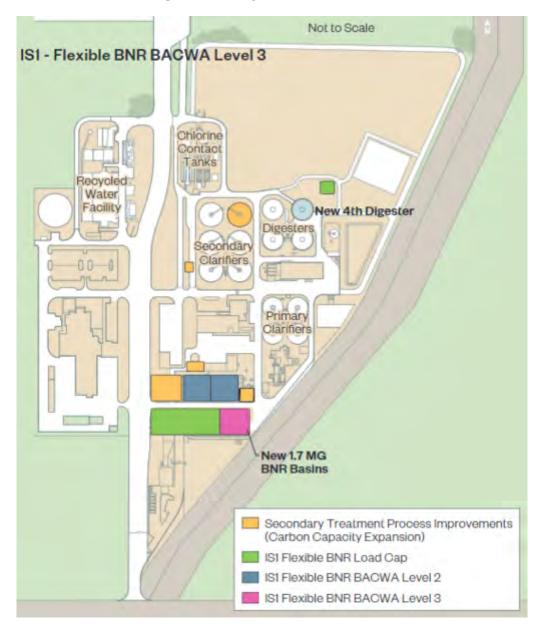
Site Layout for BACWA Level 3 (IS 1 - Flexible BNR)
